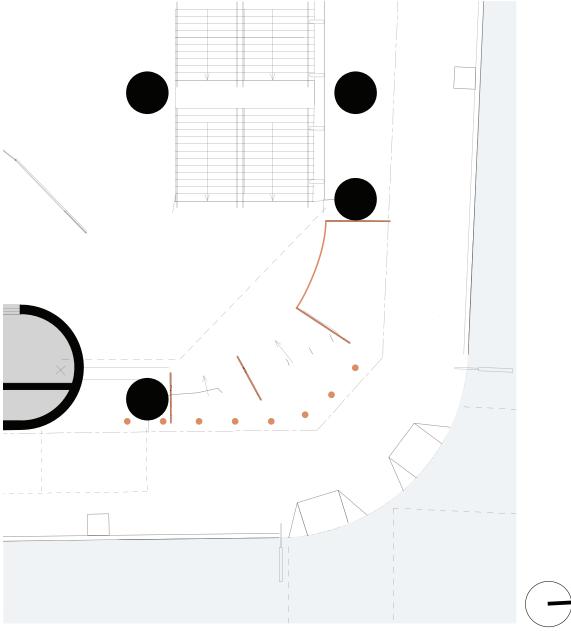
Plan — Stage 2 SSD DA Elizabeth Street Metro Entrance
